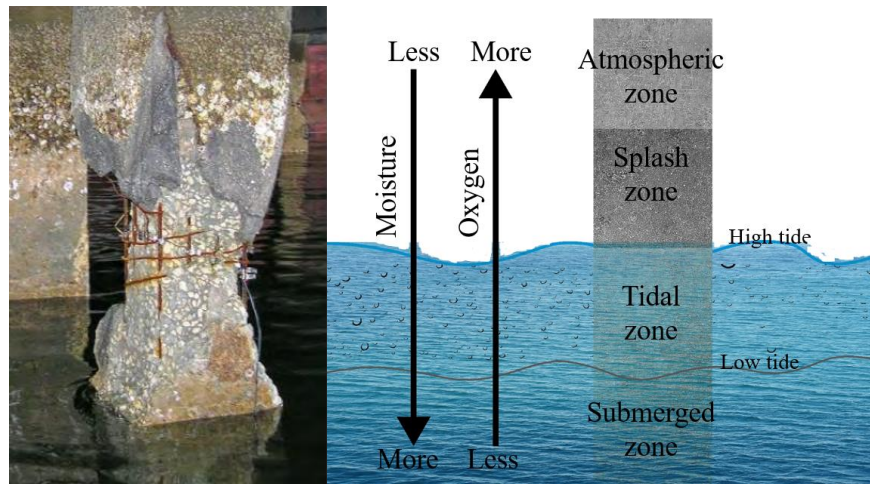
Pile corrosion zones (left photo: source unknown, right figure: drawn by the author)
